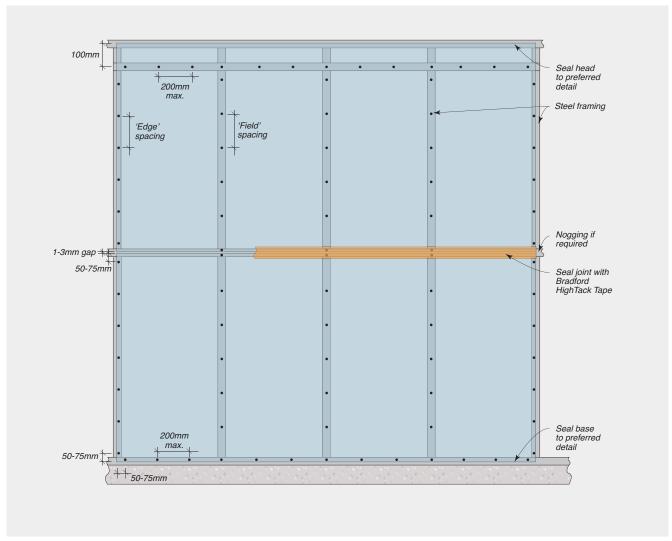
SHEET FIXING - HORIZONTAL SHEETING\* - STEEL FRAMING. NON-LOADBEARING FRAMING SHOWN.
